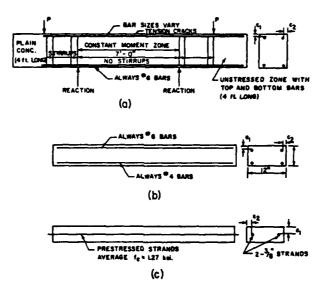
Details of specimens used by Atimtay and Ferguson (1973): (a) flexural beams; (b) unloaded reinforced slabs; (c) prestressed slabs
